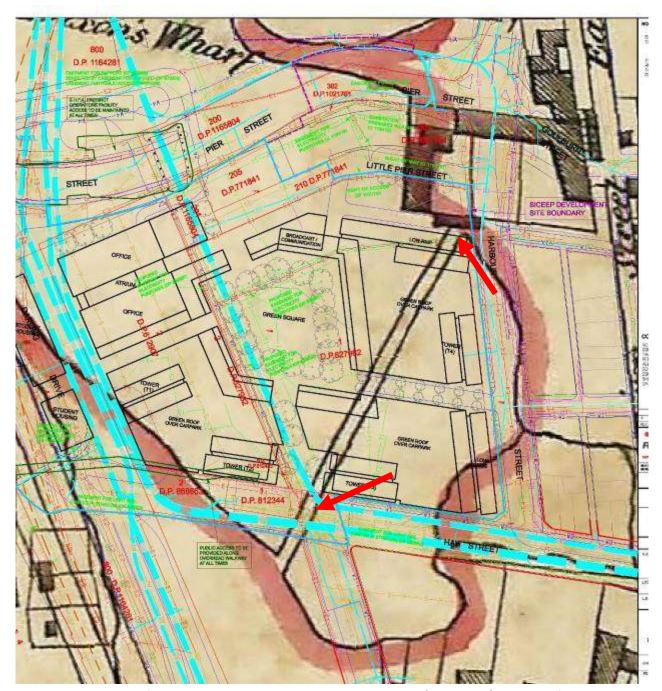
Overlay of services onto the 1854 plan showing dam wall (red arrows) to Dickson's millpond.
